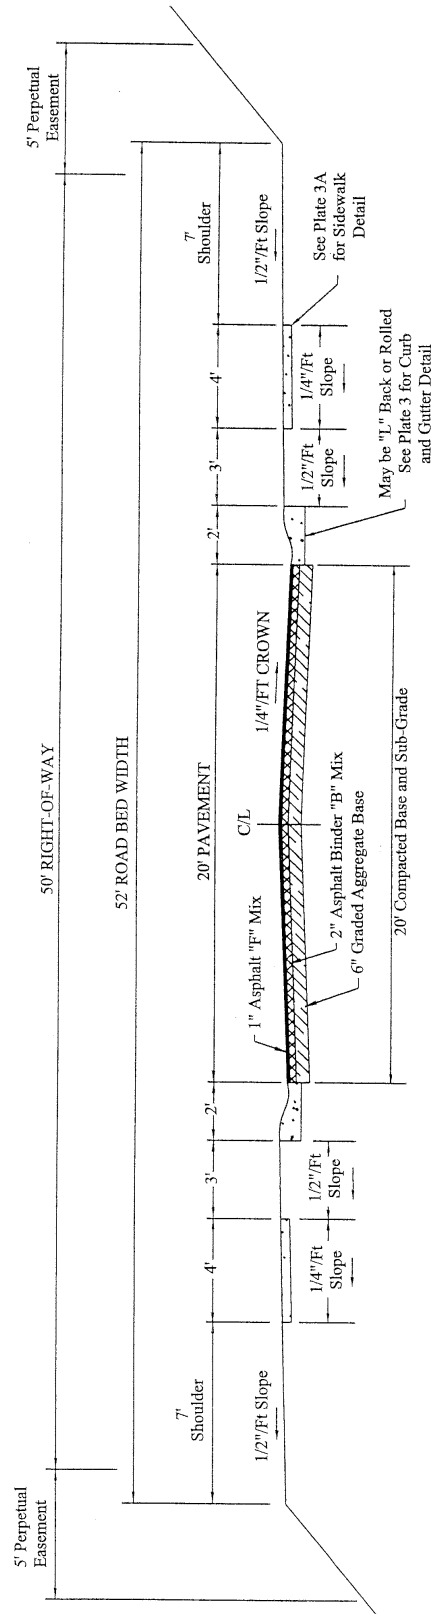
CONSTRUCTION REQUIREMENT CURB AND GUTTER
